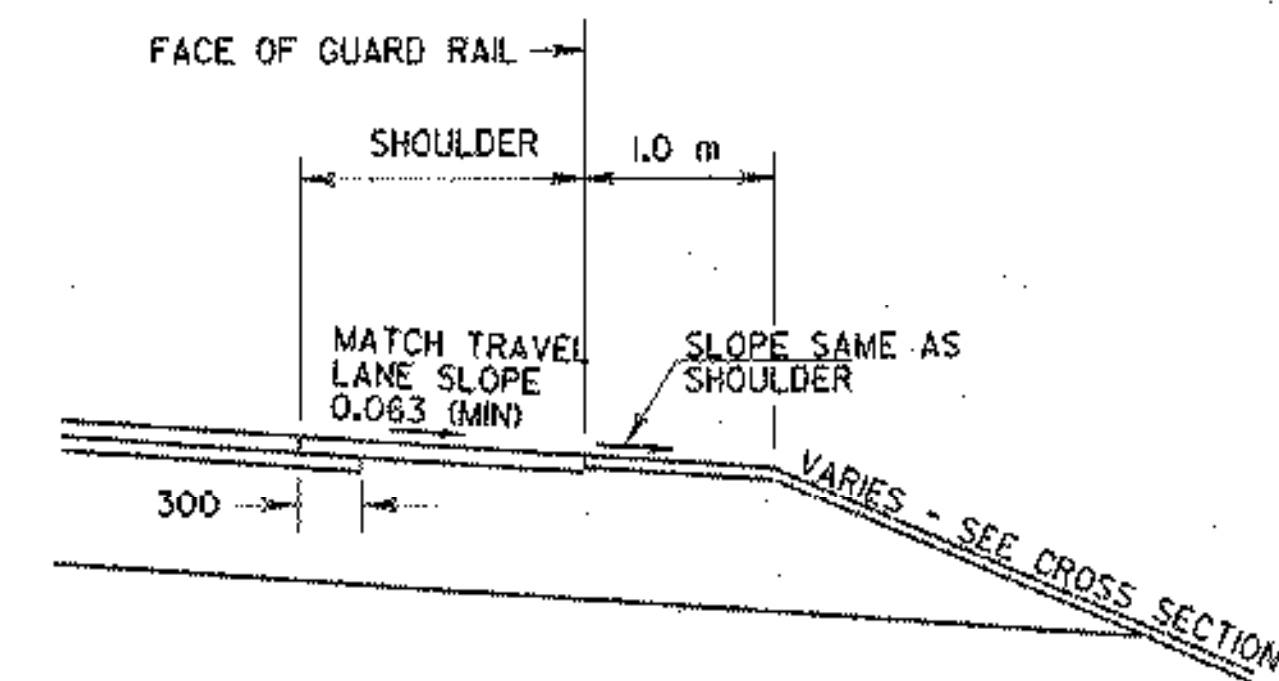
DETAIL OF GUARD RAIL ON HIGH SIDE OF BANKED SECTION
